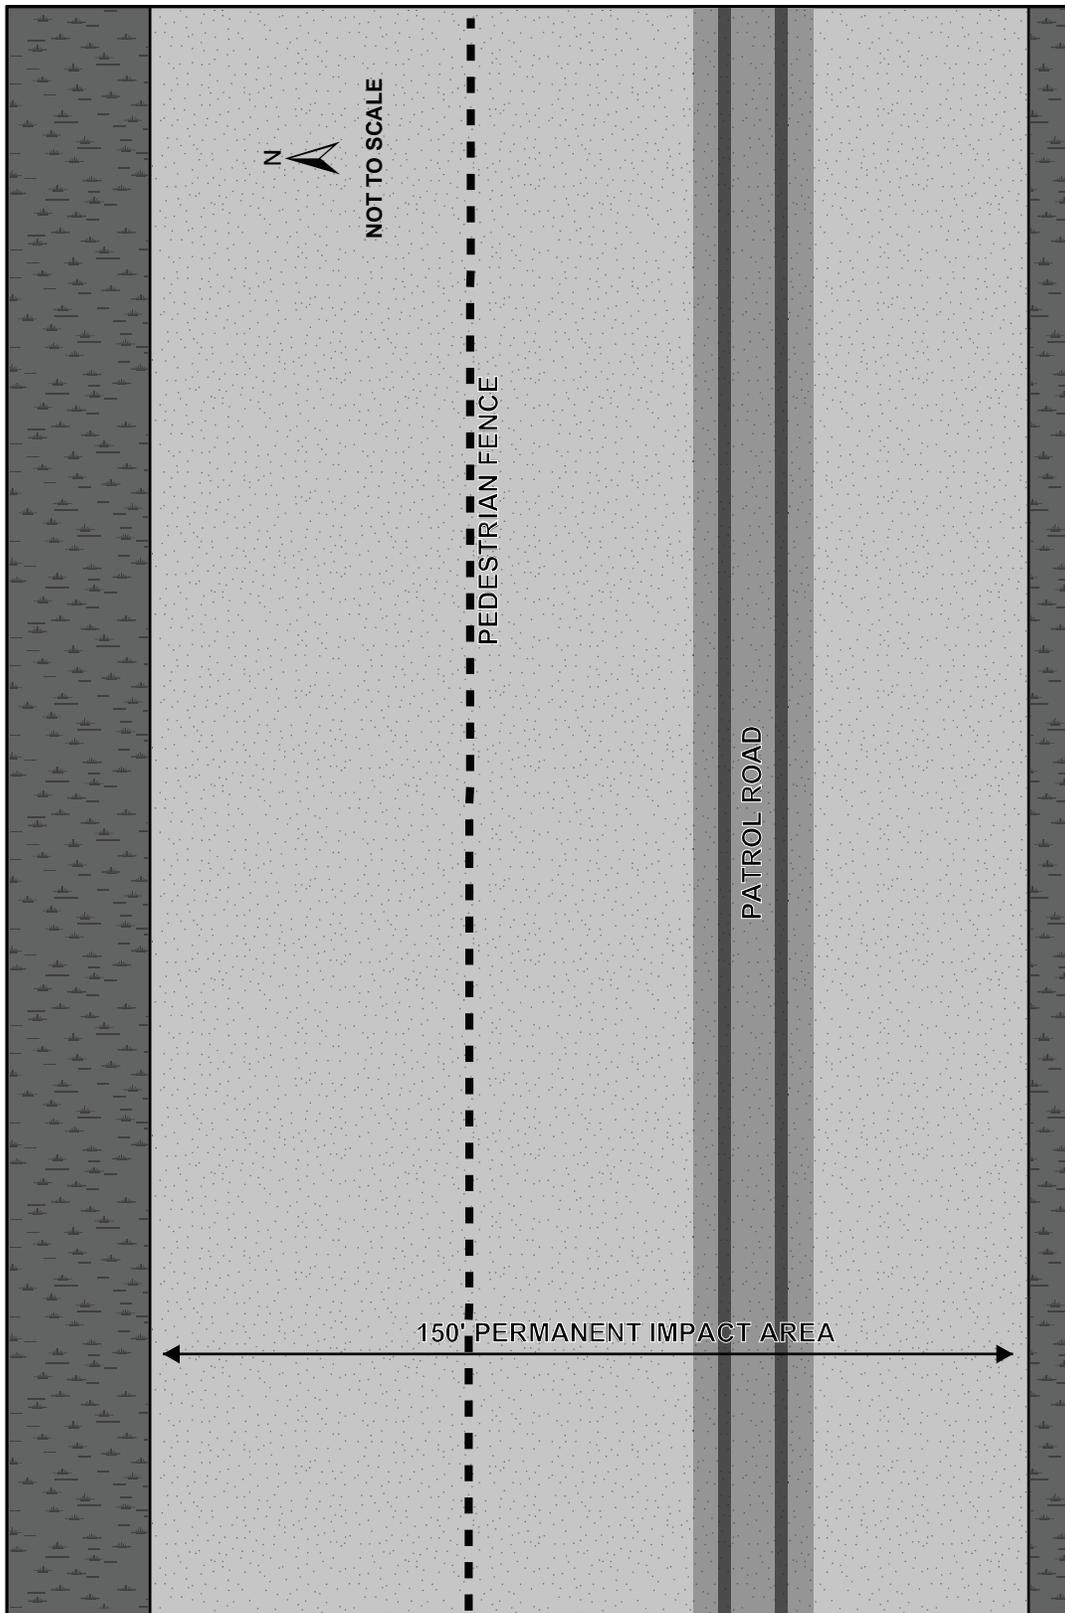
Schematic of Typical Proposed Project Corridor – Alternative 2, Section M-1
